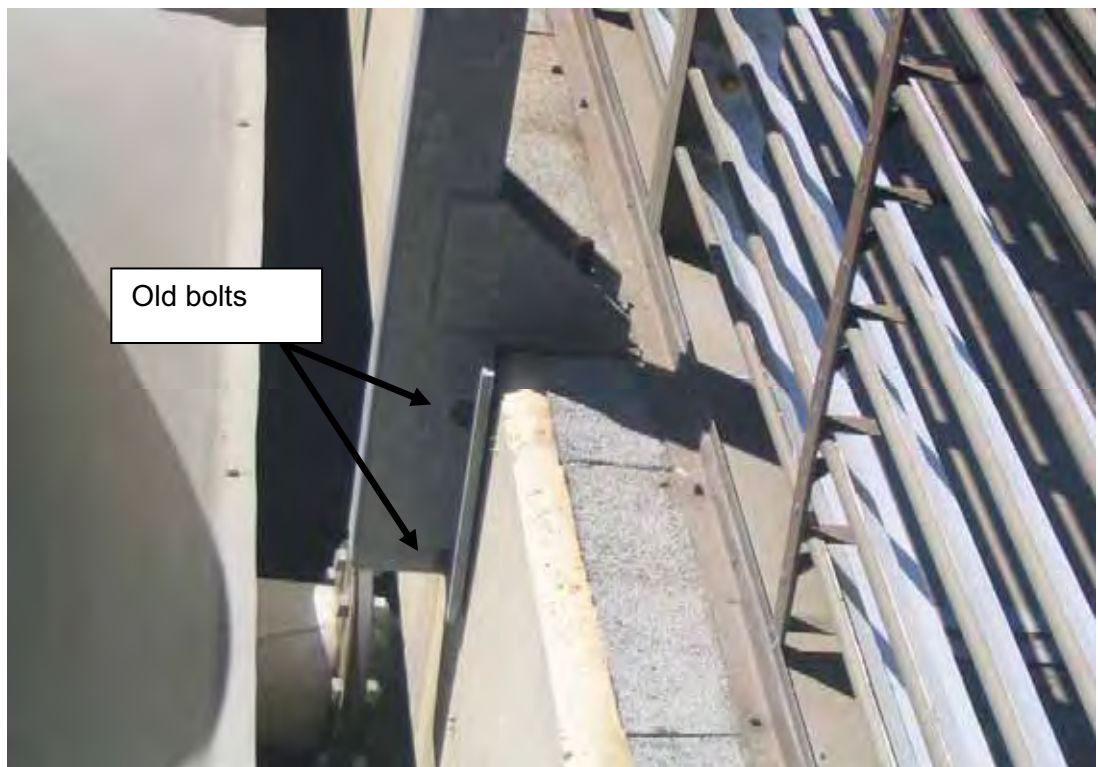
Severely corroded bolts barely holding columns supporting vertical base plate.
